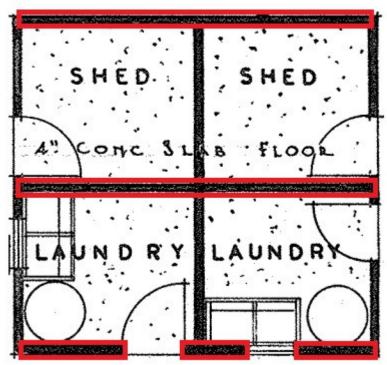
Walls used for bracing in the longitudinal direction laundry building.
